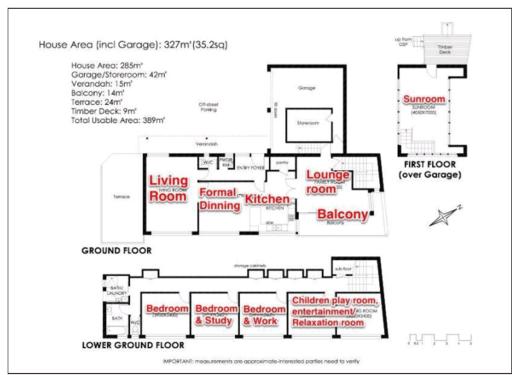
Marked up floor plan of the existing dwelling at 356 Davey Street, showing current uses. Source: Representation received.
